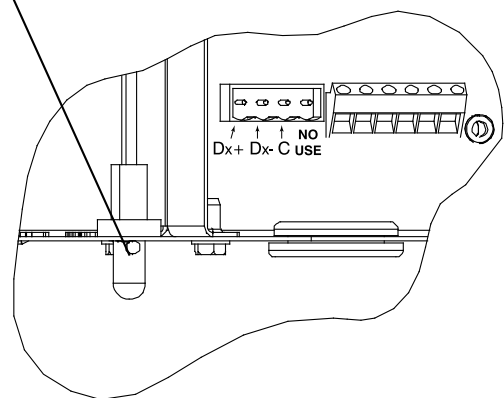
Outdoor Air Thermistor (OAT) Attachment
